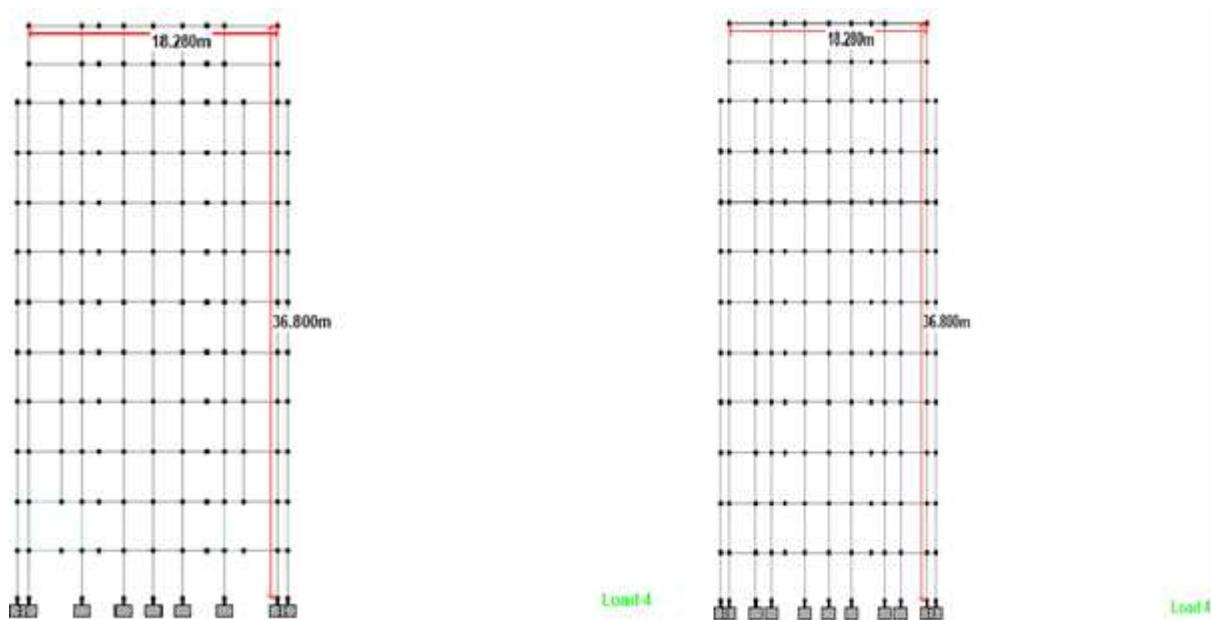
Basic Elevation of the building with and without floating column and shear wall
